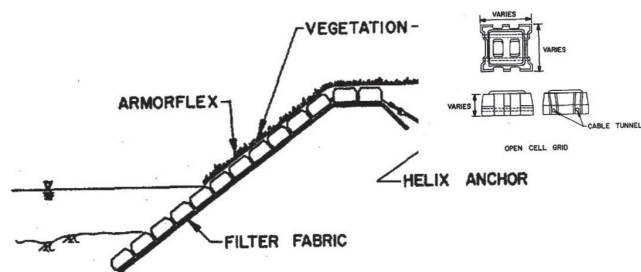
Section of a typical precast concrete blocks system (after Brown and Clyde 1989).
